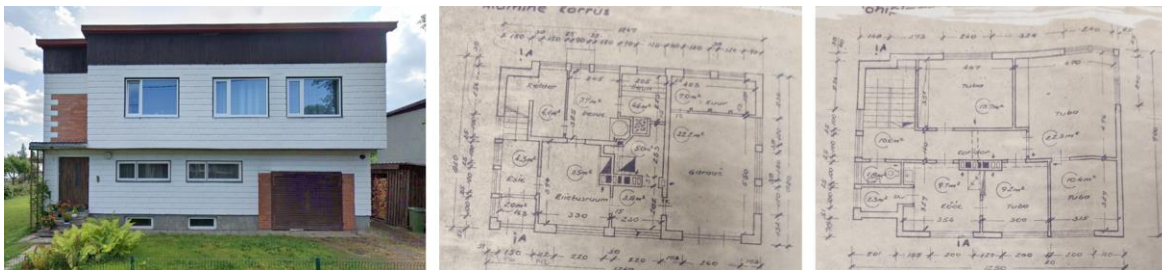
Lõuna põik 7 (1976), example of a raised bungalow in Väike-Maarja (left to right: view, ground floor layout, upper floor layout)
